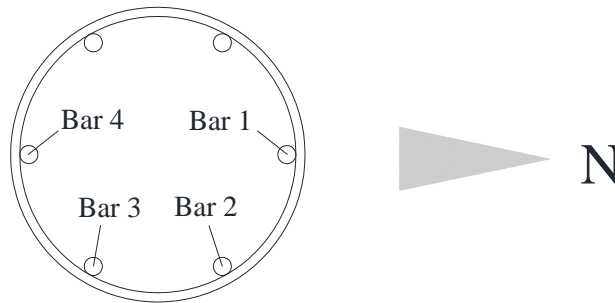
Strain gages on longitudinal bars in the column of Specimen #3
